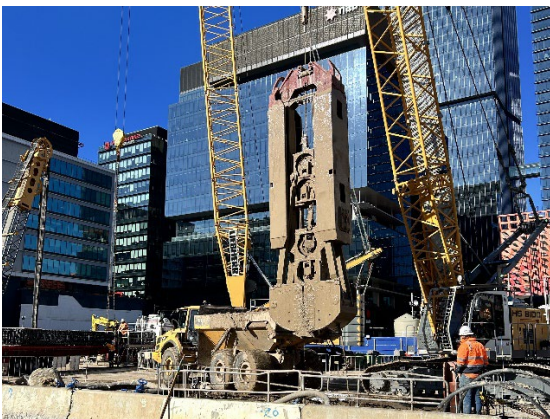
Parramatta Site – D-Wall excavation with grab with material being loaded into Moxy
